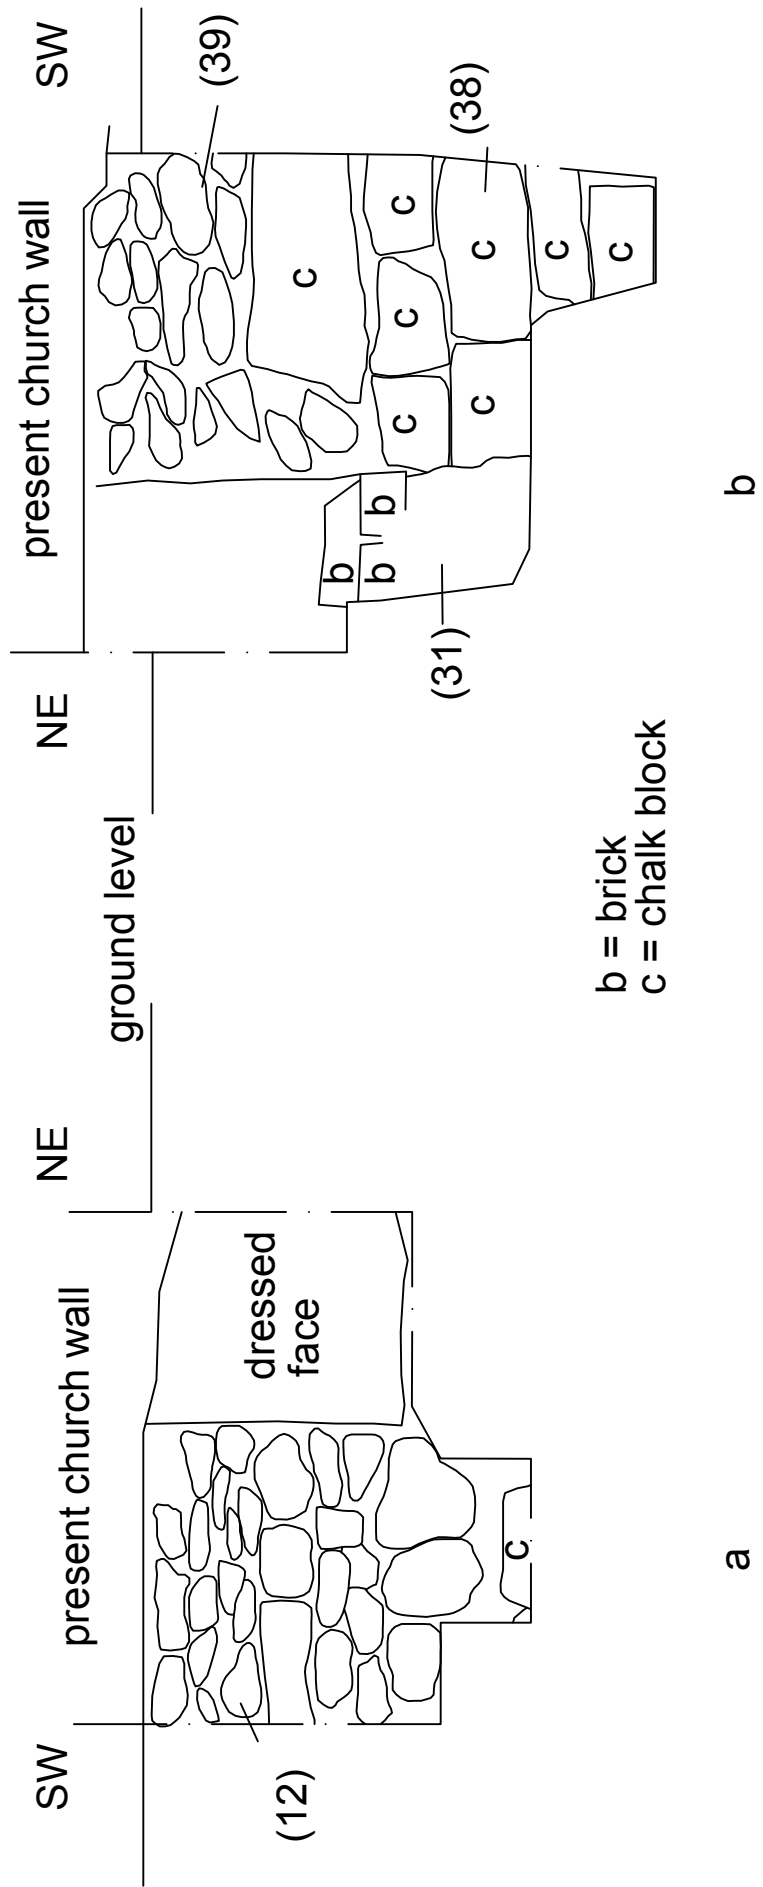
a) Trench 11 South-east facing section. Scale 1:20.
